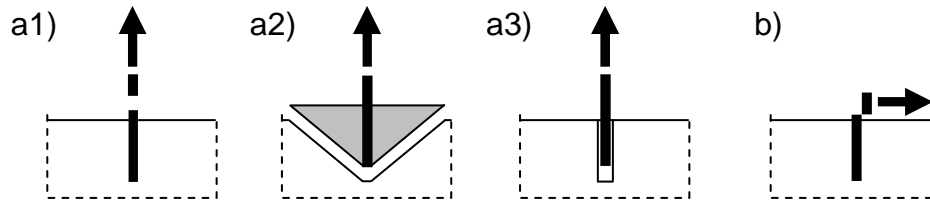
Failure modes of anchors loaded in a) Tension and b) Shear: a1) Steel failure; a2) Concrete failure; a3) Pullout failure; b) Steel failure
